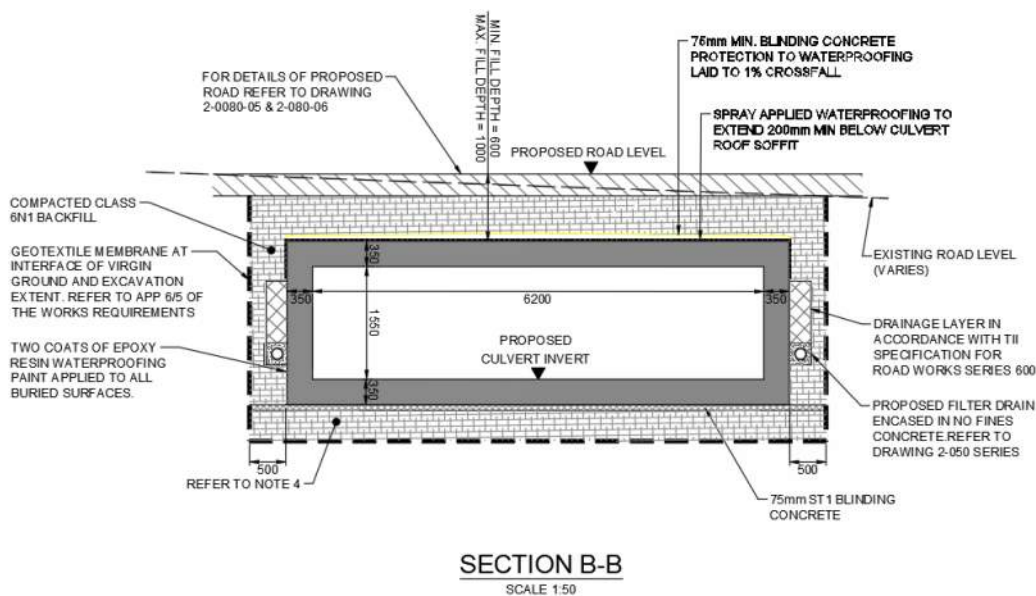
Hazelwood Flood Relief Culvert - Typical Cross Section
